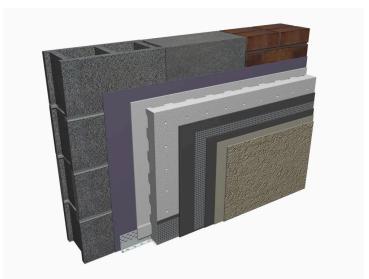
PUCCS EIFS with Roller Bear and Polar Bear over masonry, concrete, and brick
